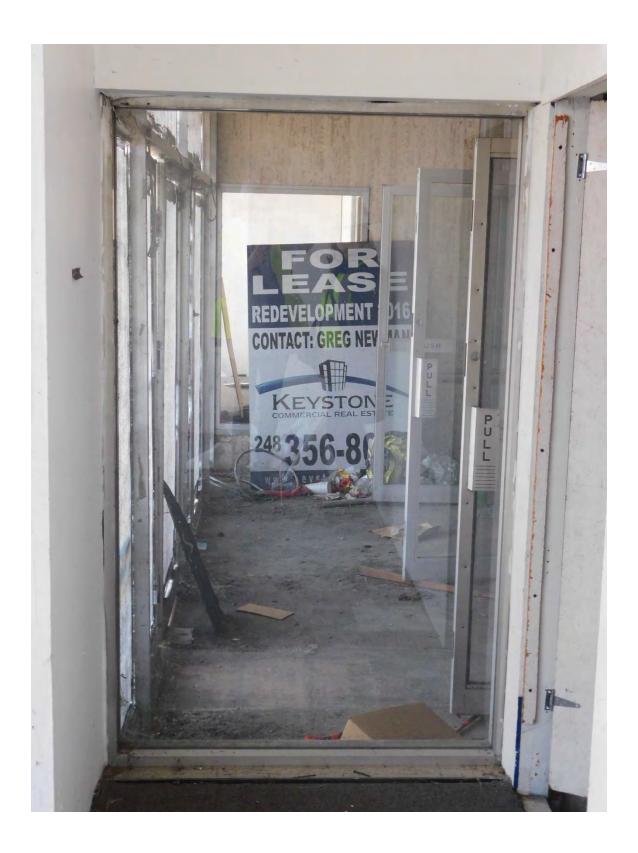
Interior, 1st Floor Storefront Window into Vestibule, Looking South. 10/15/19
